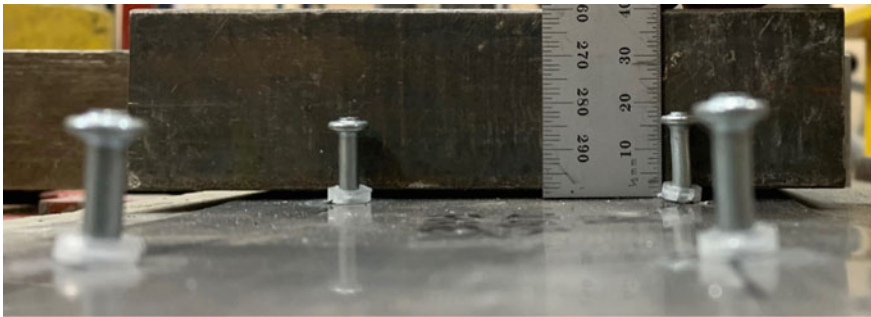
Surface image of test A8 showing four under-fastened fasteners (40 mm fastener, no pre-drilling)
